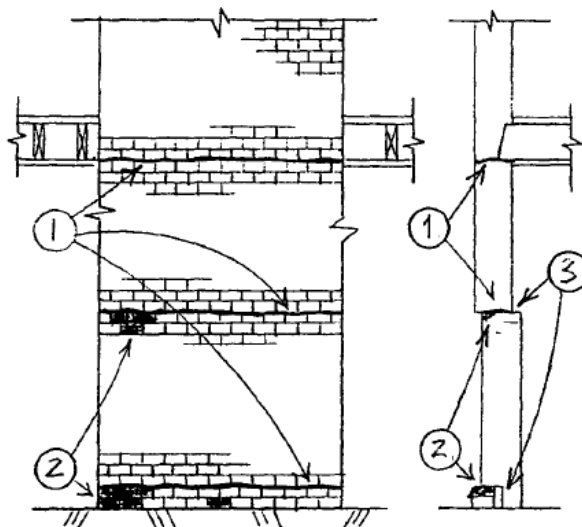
Typical appearance of out-of-plane failure under one-way bending. 1: Cracks; 2: Spalling and rounding at edges of units along crack plane; 3: OOP offsets along cracks. (FEMA, 1998)
